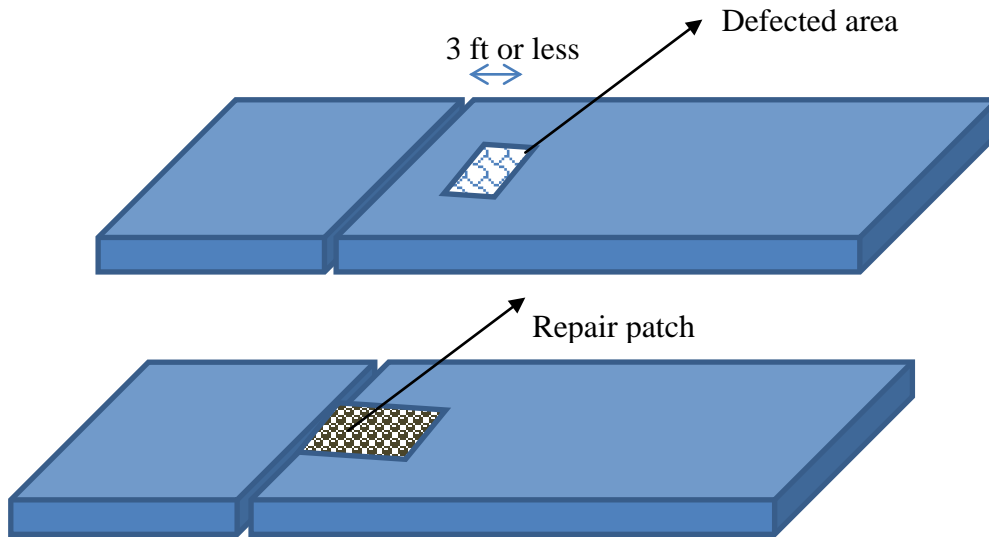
ODOT recommendation for jointed concrete pavement repairs when defect area is close to joints.
